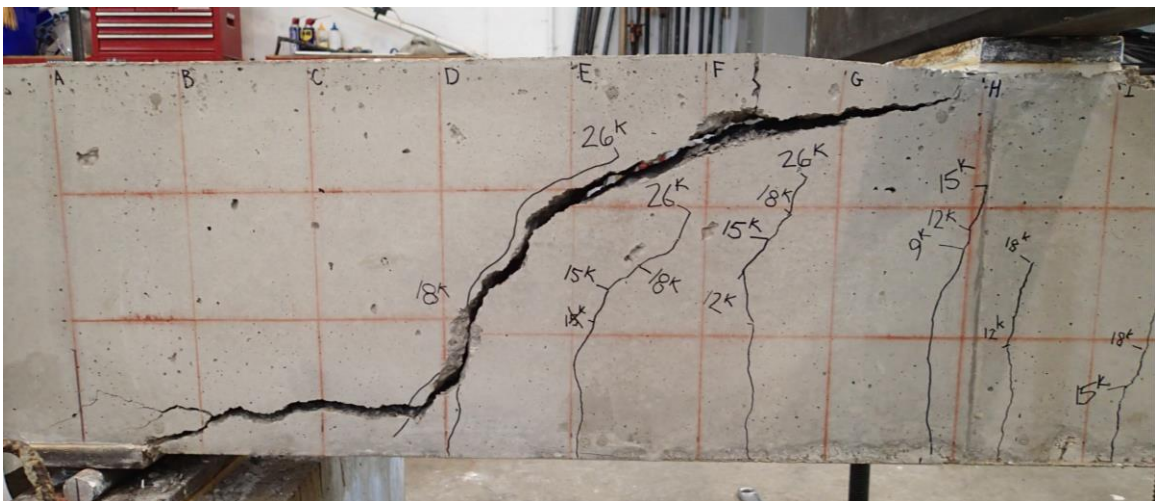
Specimen F-3: North Side Failure Inclined Crack
